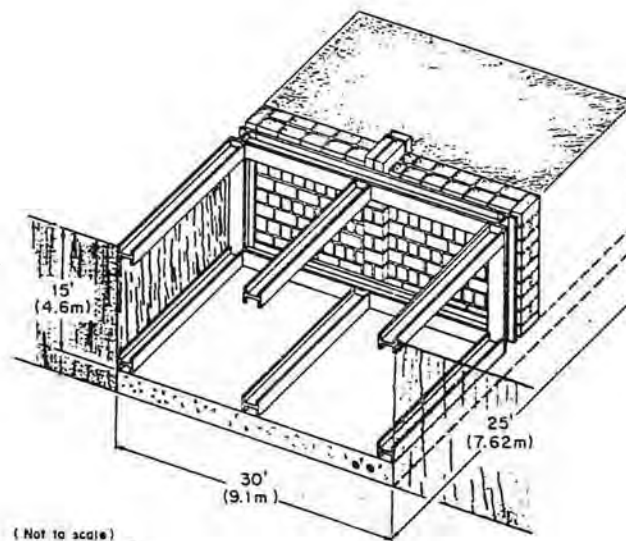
Test chamber for pneumatic and hydrostatic testing of seals.
